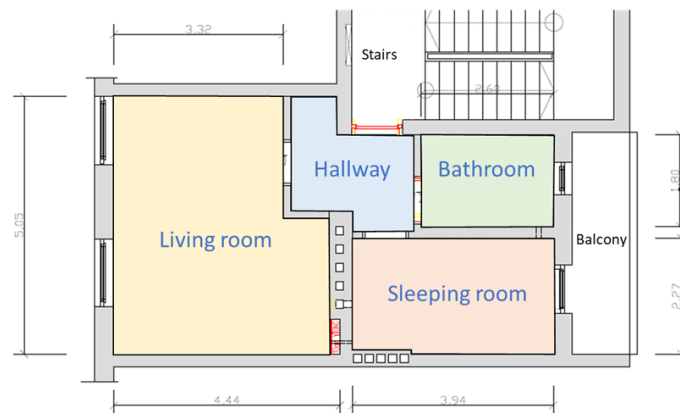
Floor plane of one of the one-room apartments subjected to renovation, with a floor area of 37.3 m².
